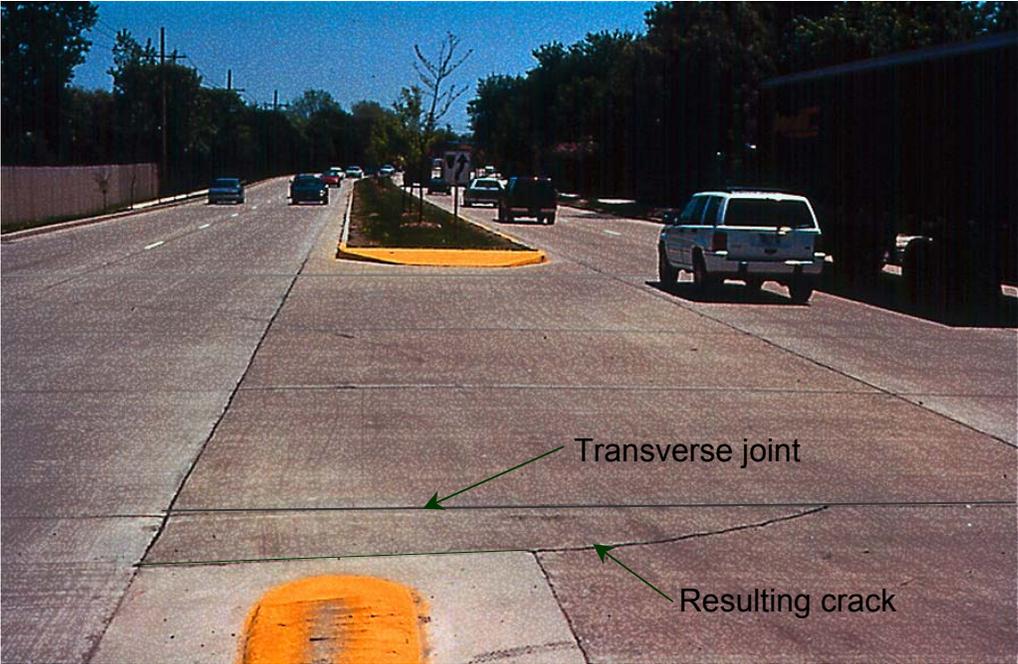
Crack developed when joints were not aligned with channelization. (Photo courtesy of American Concrete Paving Association).
